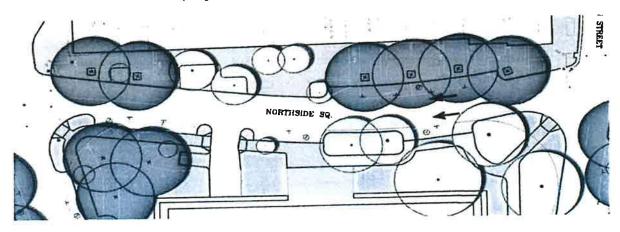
EXHIBIT D LEASE SPACE AREA OF PUBLIC PARKING FACILTIES
